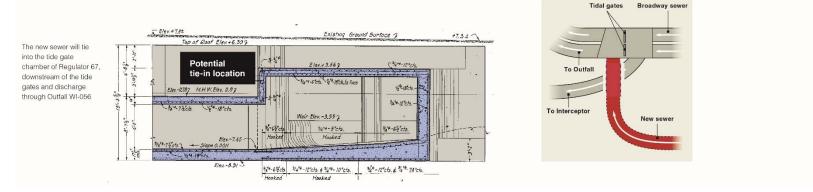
Proposed Piped Connection to Outfall at the Downstream End of the Daylighted Section
